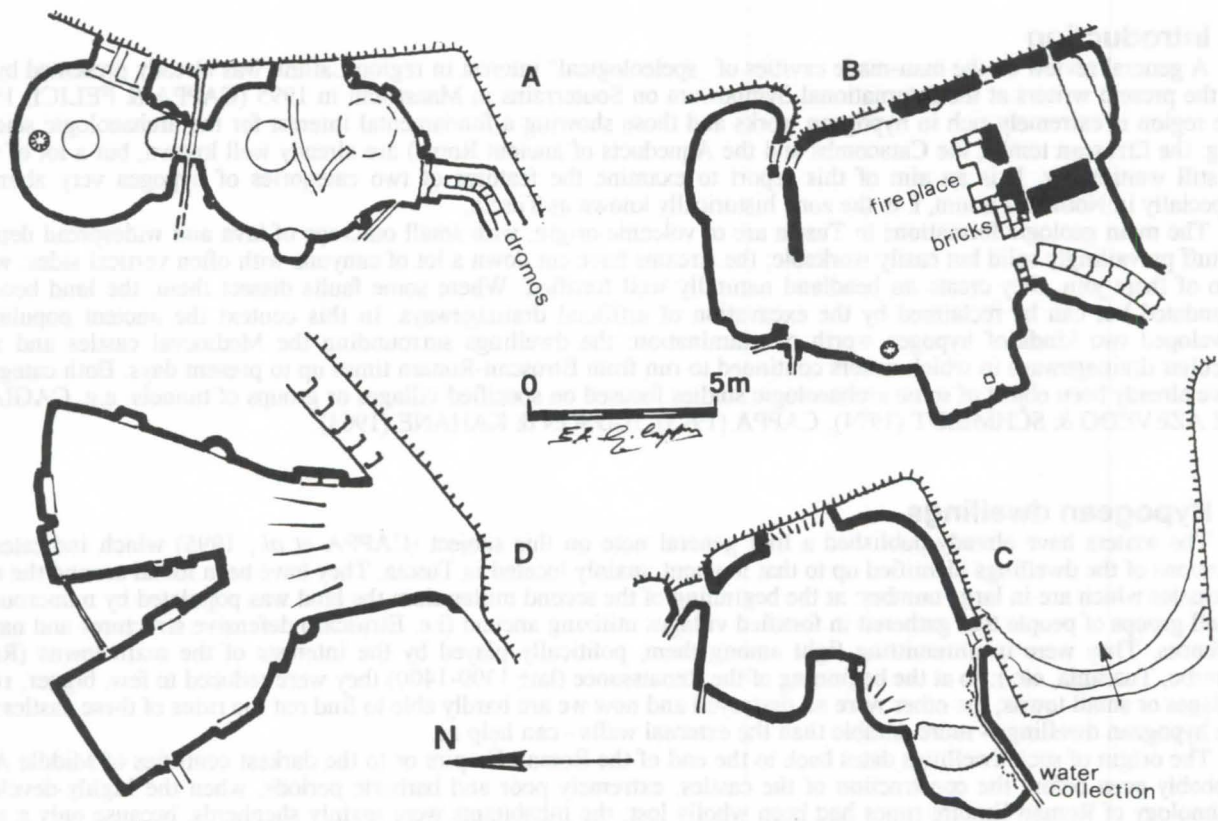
Plan of typical dwellings: A - multiple chambers, round shape. B - with recent use remains. C - access from the external scarp. D - closed Y shape.
